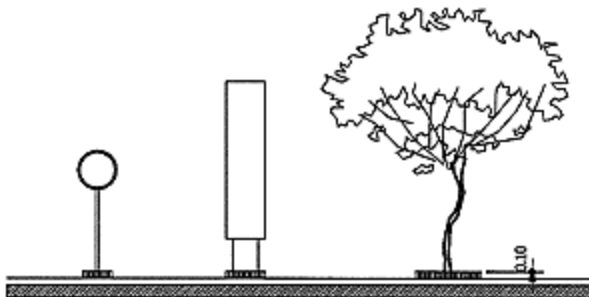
Raised platform around tree (alternatively tactile grooves can be used see section 4.2.2.2)
